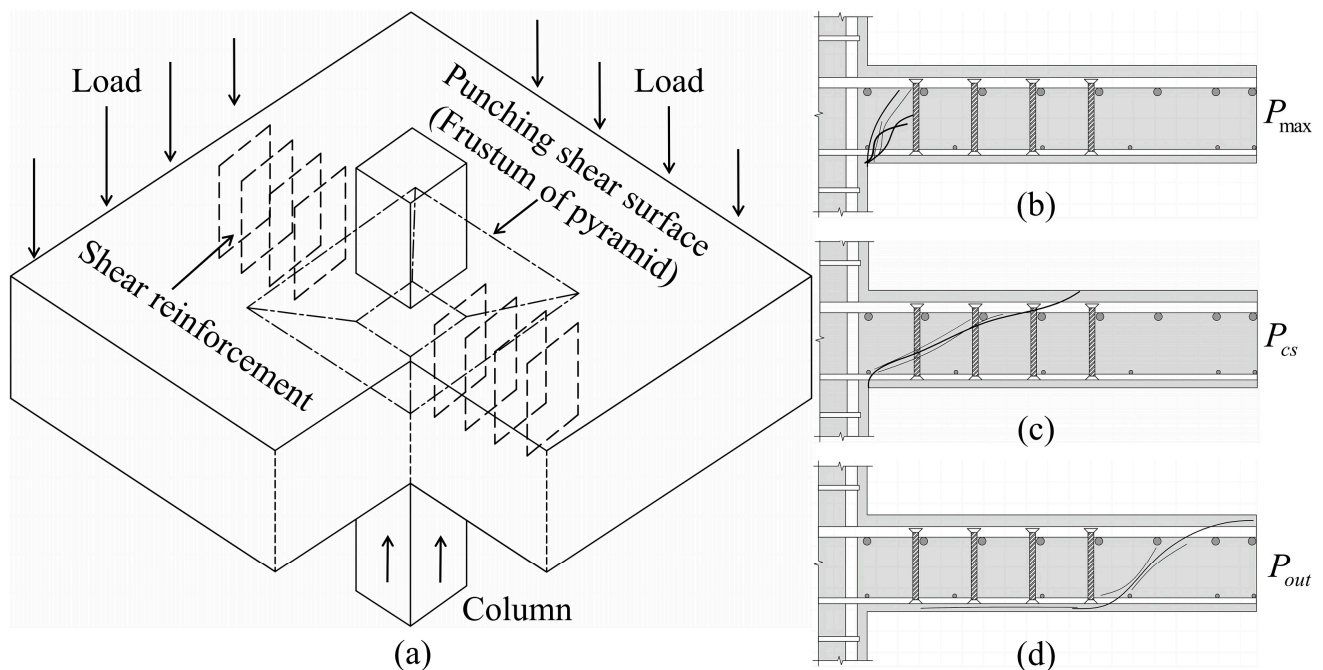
Types of failure: (a) slab-column connections with shear reinforcement; (b) crushing of compression strut; (c) failure within shear-reinforced zone; (d) failure outside shear-reinforced zone.
